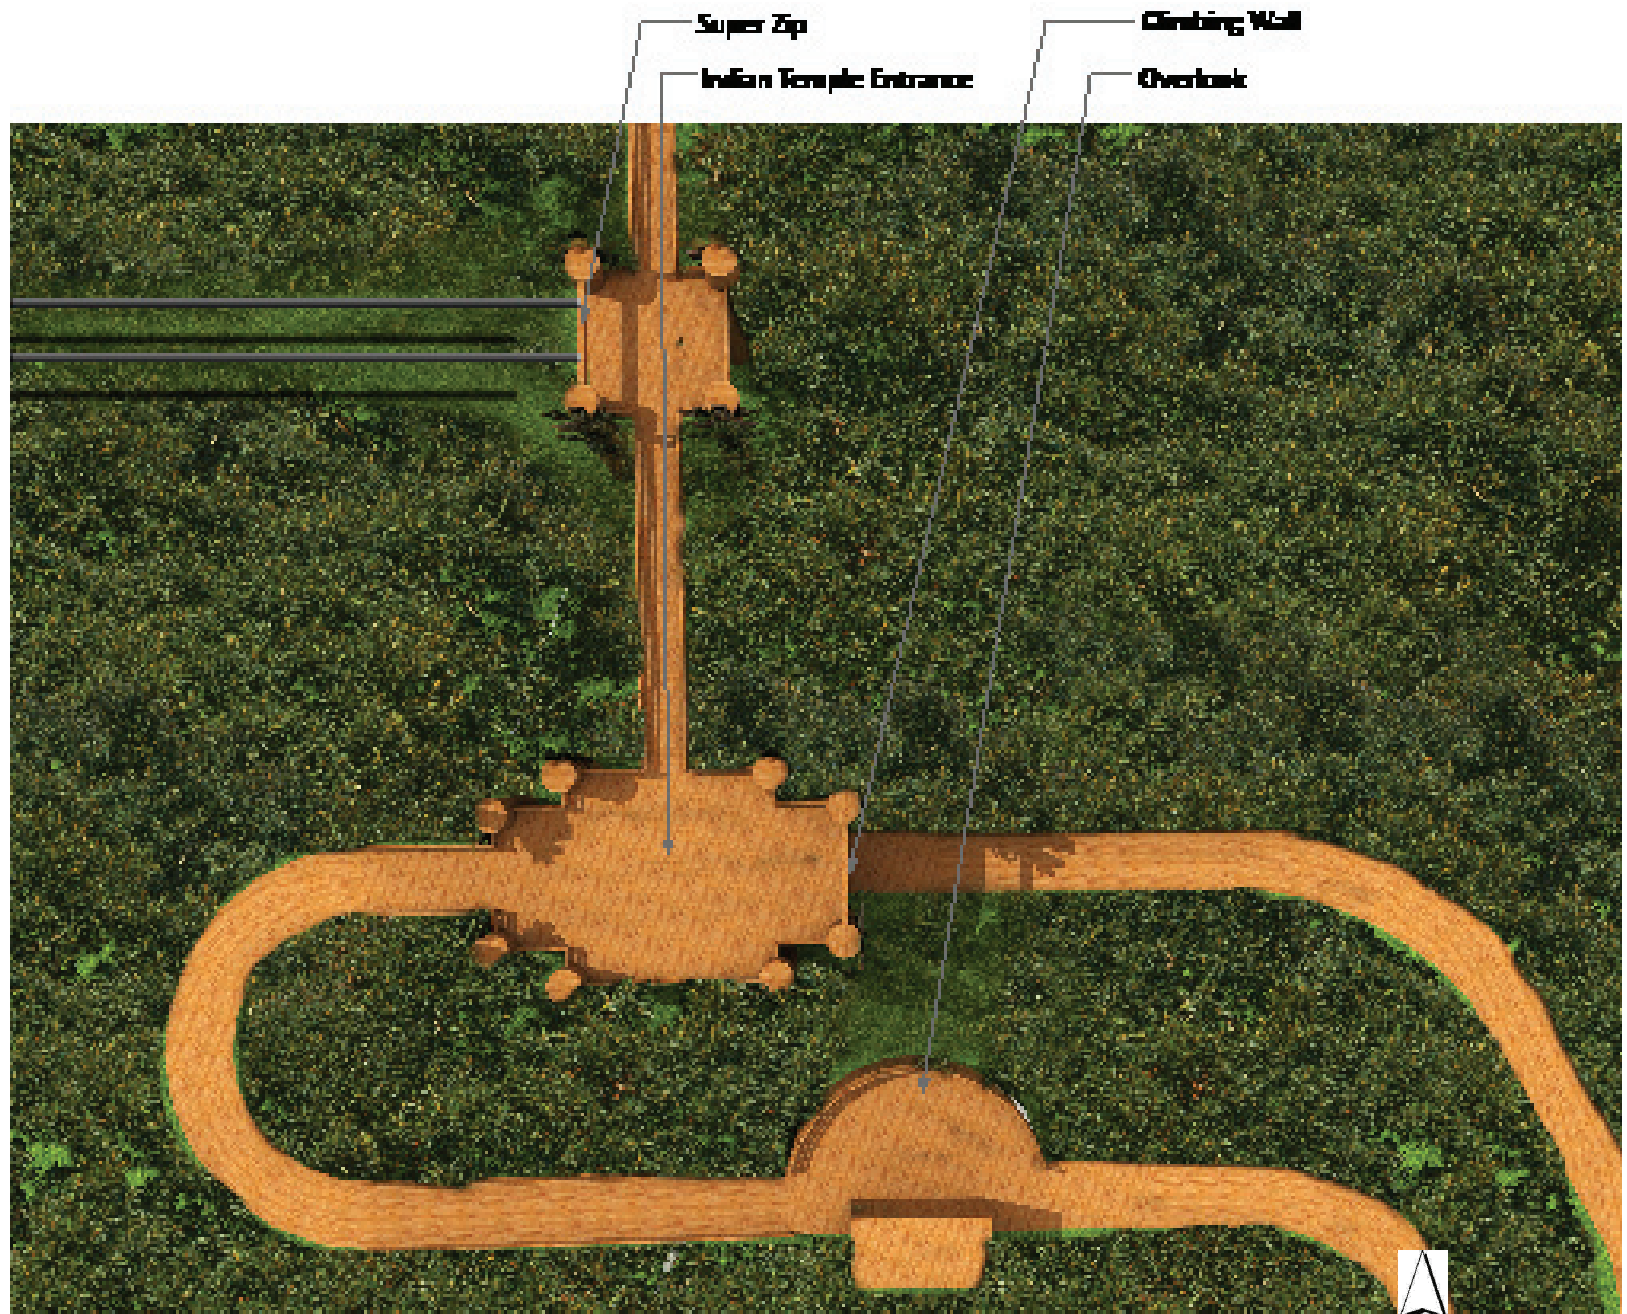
Observation deck, climbing wall and super zip in plan. (Amanda White)
